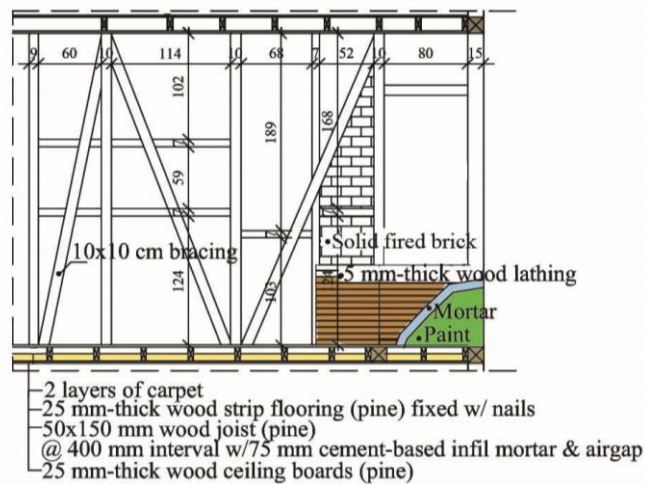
Elevation of Semi-Repaired-Wall 2 & Section of Semi-Repaired-Floor 2 in 1/50 scale (Drawn by author).
